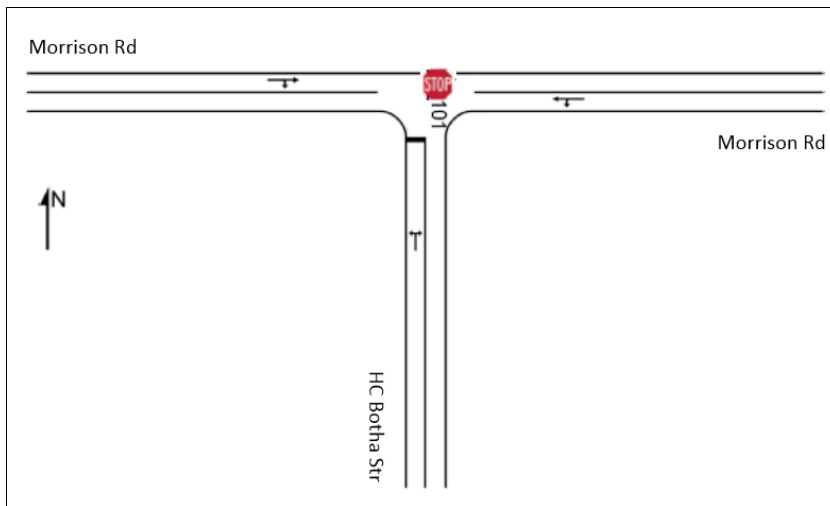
Intersection: Geometry: Morrison Road and HC Botha Street
